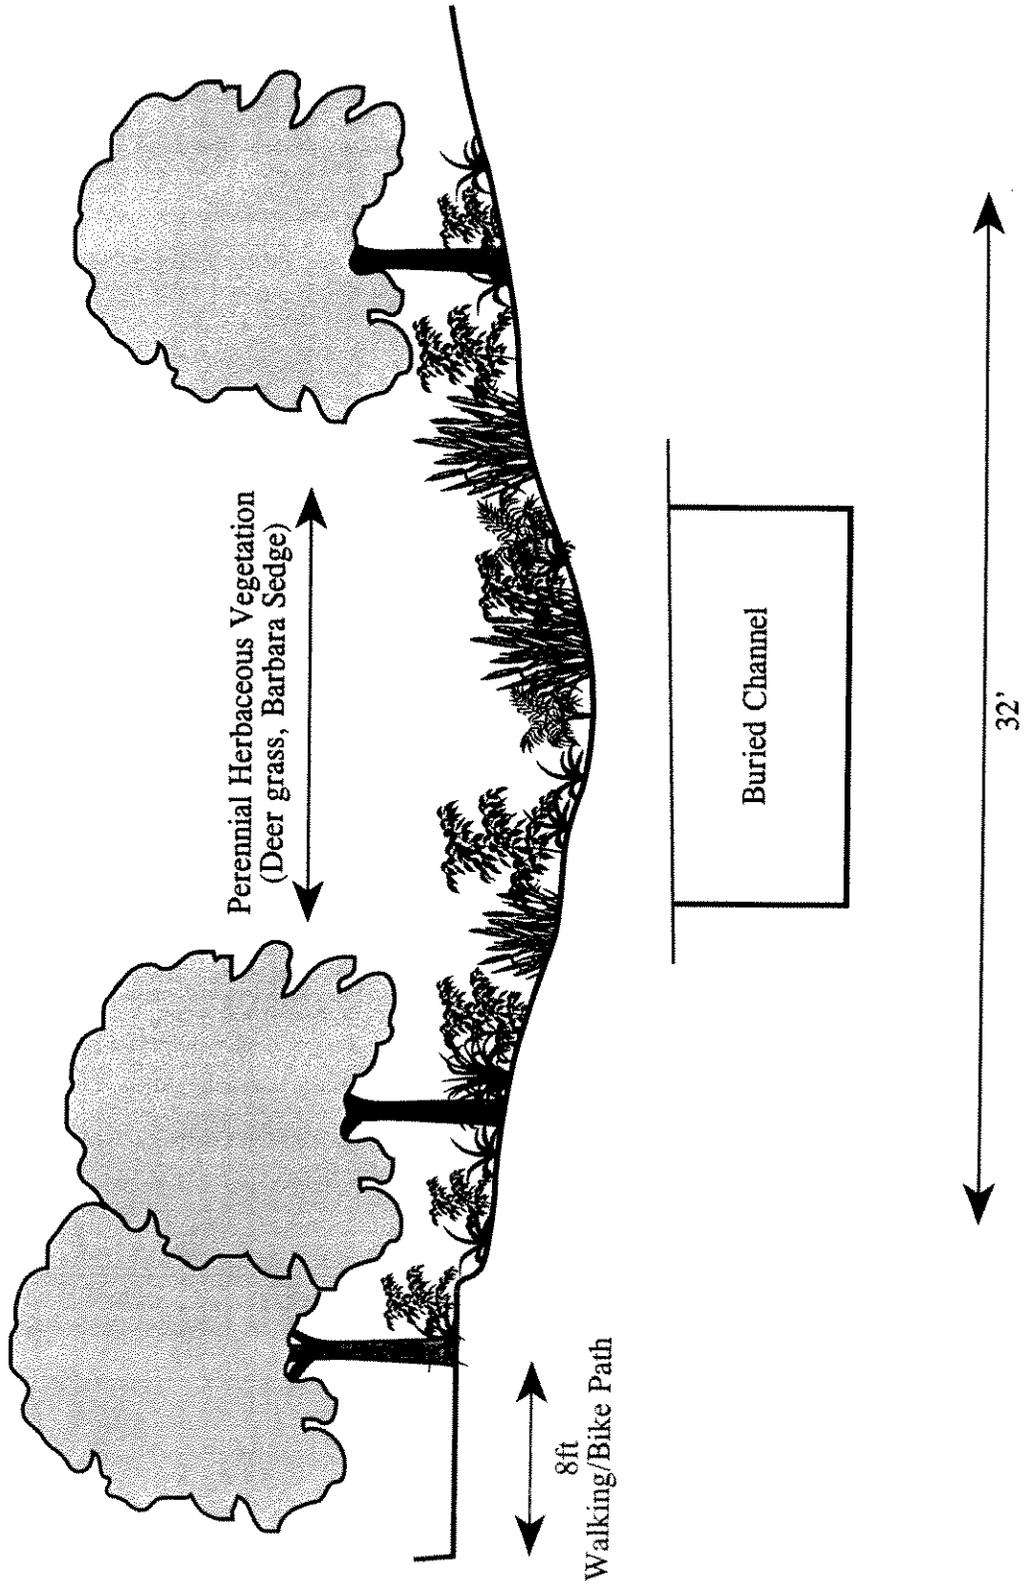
Conceptual Cross Section of Proposed Box Culvert, Line M Channel, Union City, Ca
